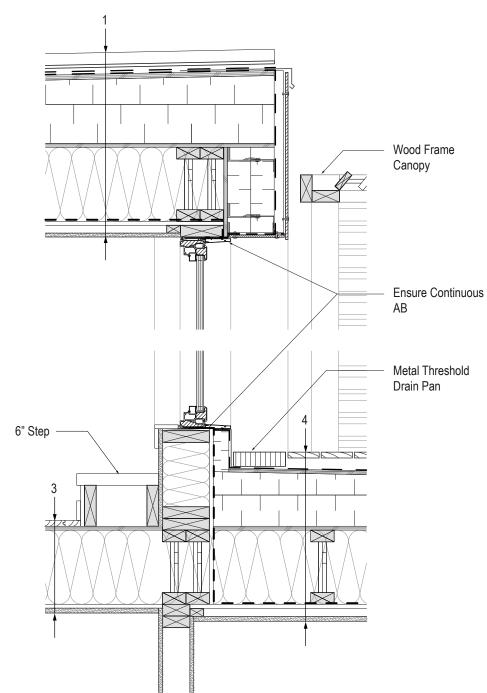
North Aperture Sill & Top Plate Scale: 1" = 1'-0"
